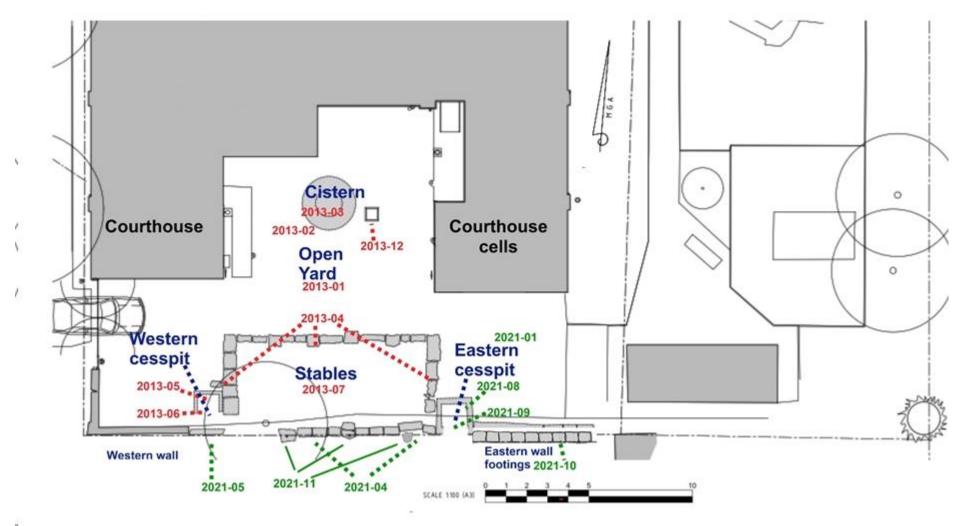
Context Plan Base Plan by Peter Donn & Eureka
